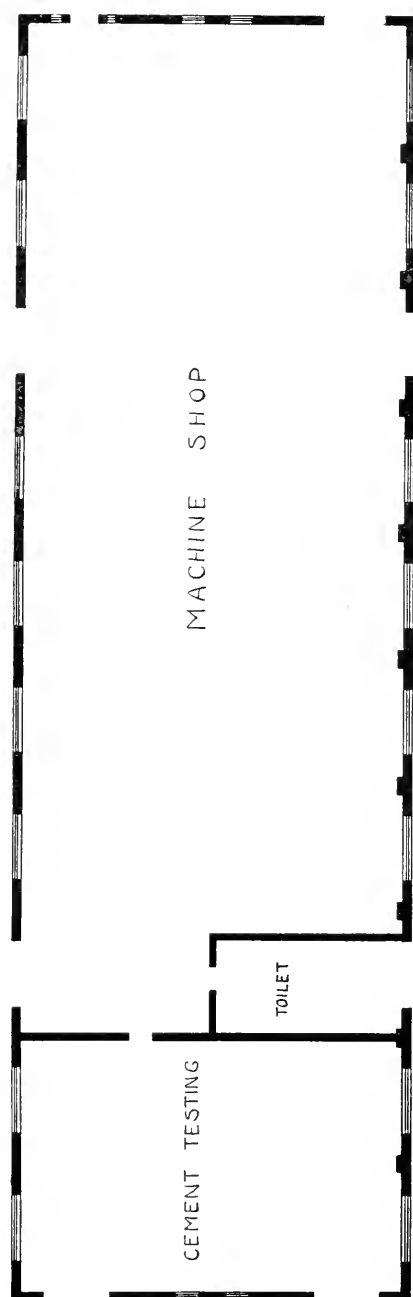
FLOOR PLAN OF SHOP NUMBER TWO.
